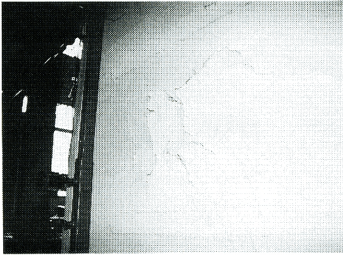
Shear crack at the deformation angle 1/15rad (No.4b)
